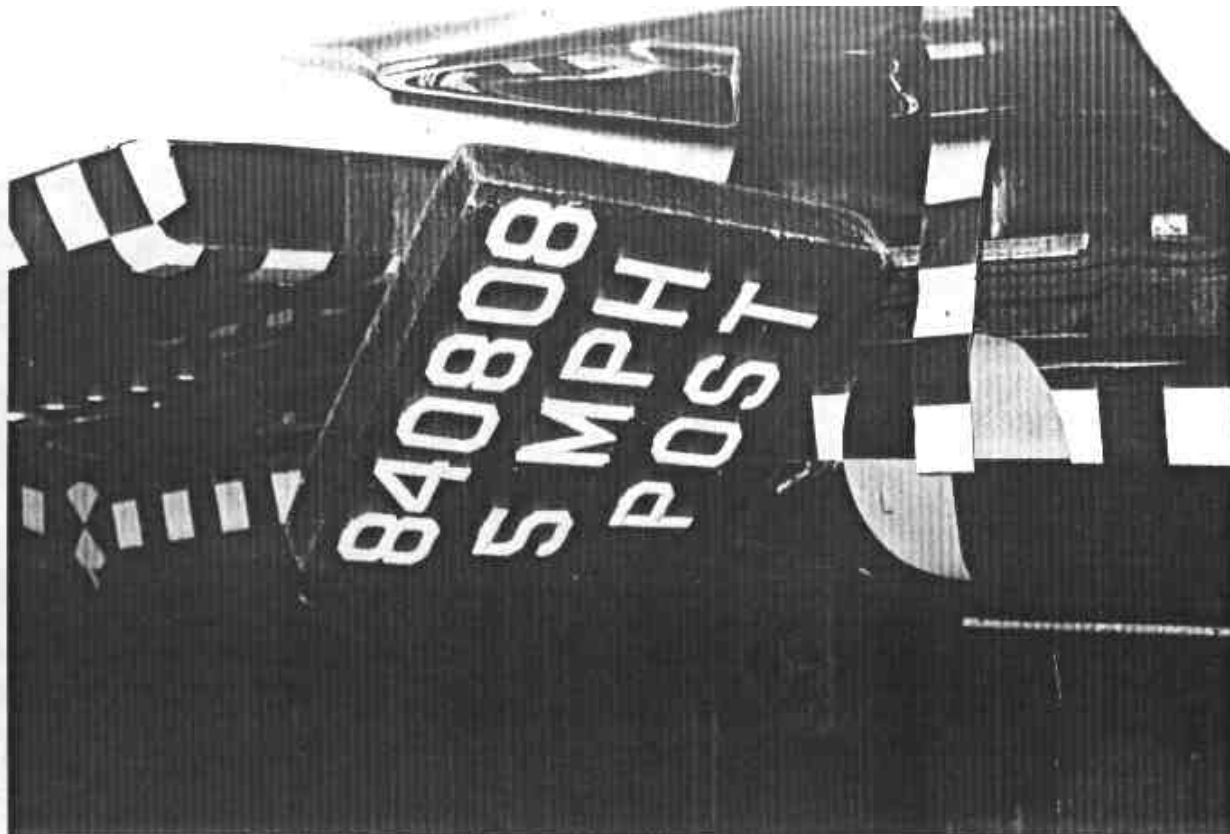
POST-TEST CLOSEUP - VIEW 1
